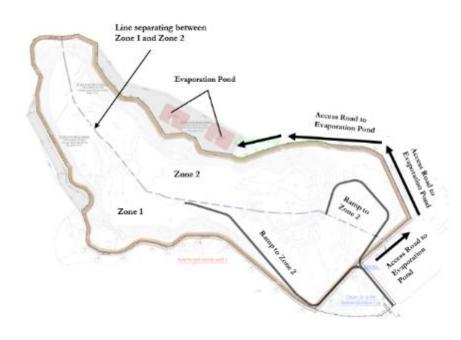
Surrounding Road and access ramps leading to zone 1 and zone 2
